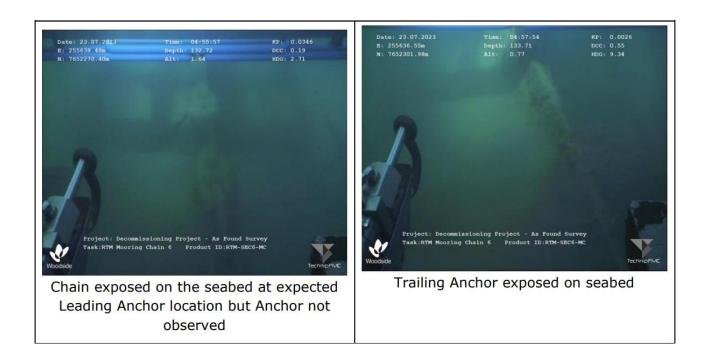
Mooring 6 Trailing Anchor exposed on seabed.
